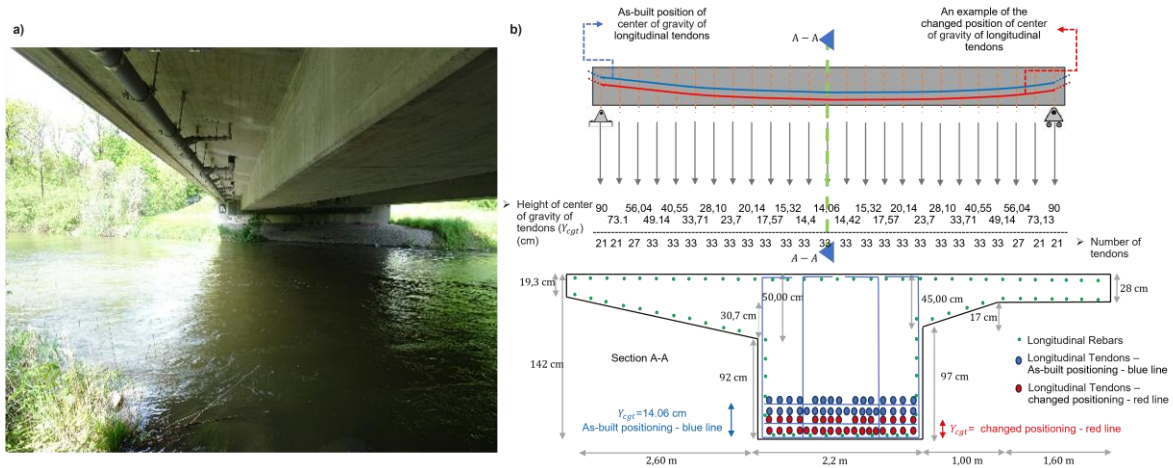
a: “Amperbrücke” bridge structure, b: Positions of longitudinal tendons.
